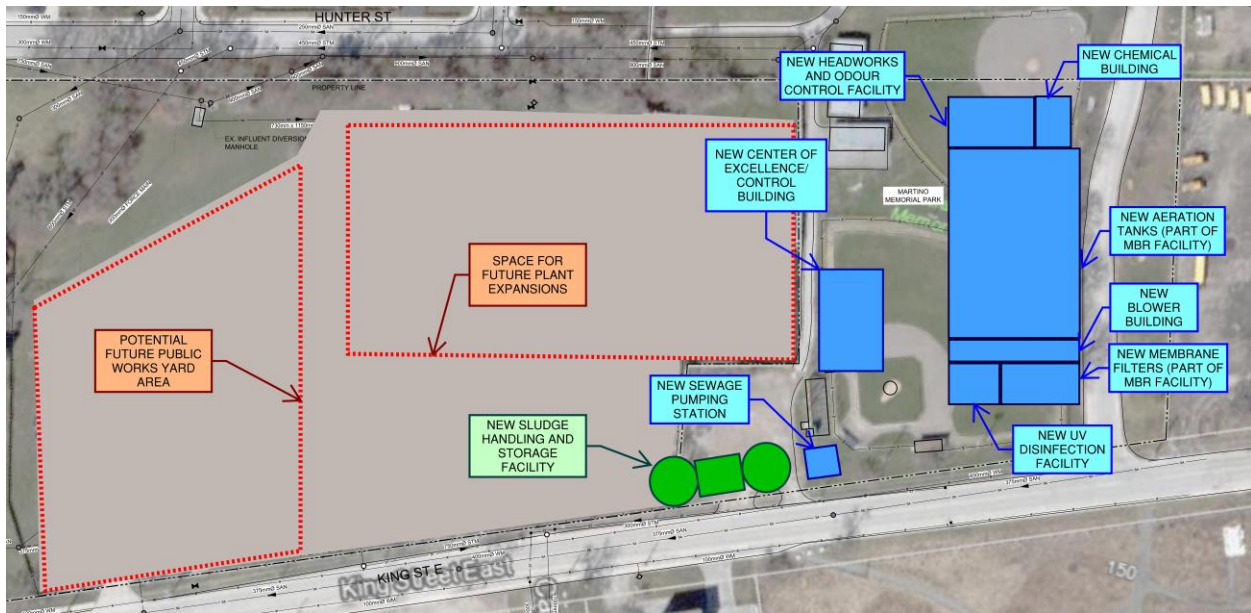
Site Layout B Implementation – Potential Future Contracts
